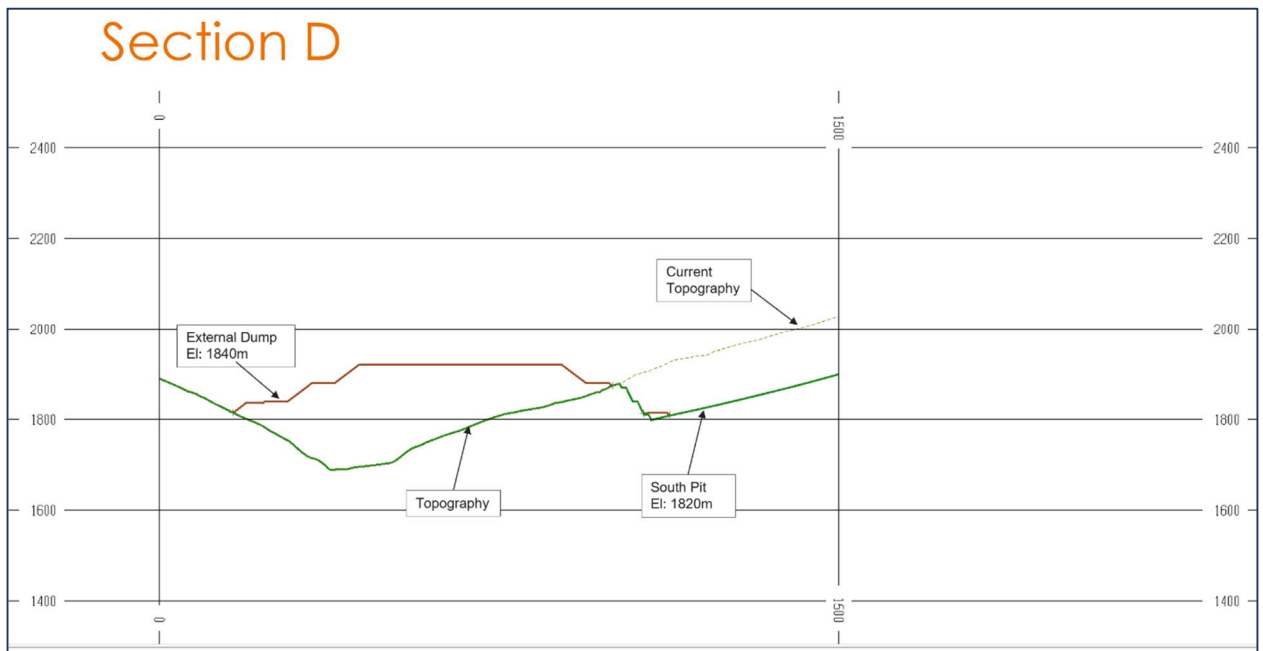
Cross-Section D, Mine Rock Storage Facility
